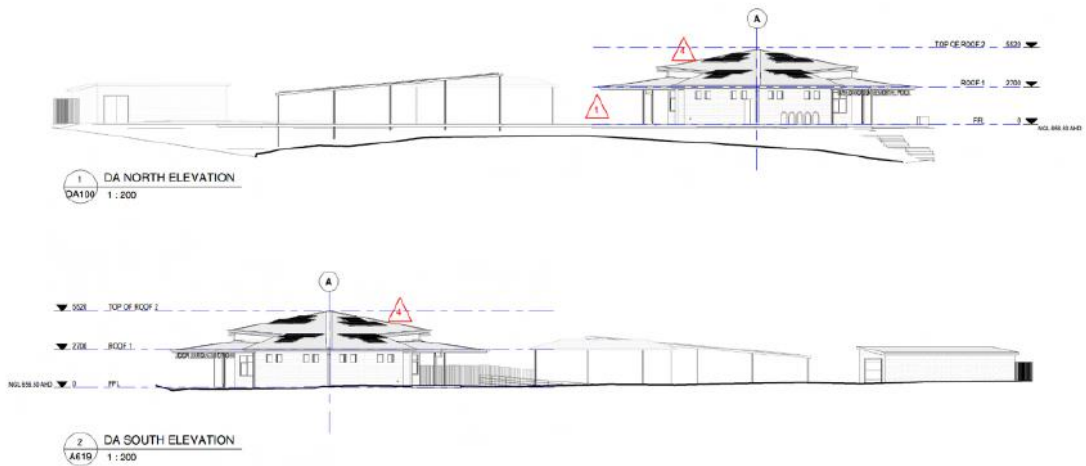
Proposed North and South External Elevations (Prepared by Paul Barnett Design Group)
